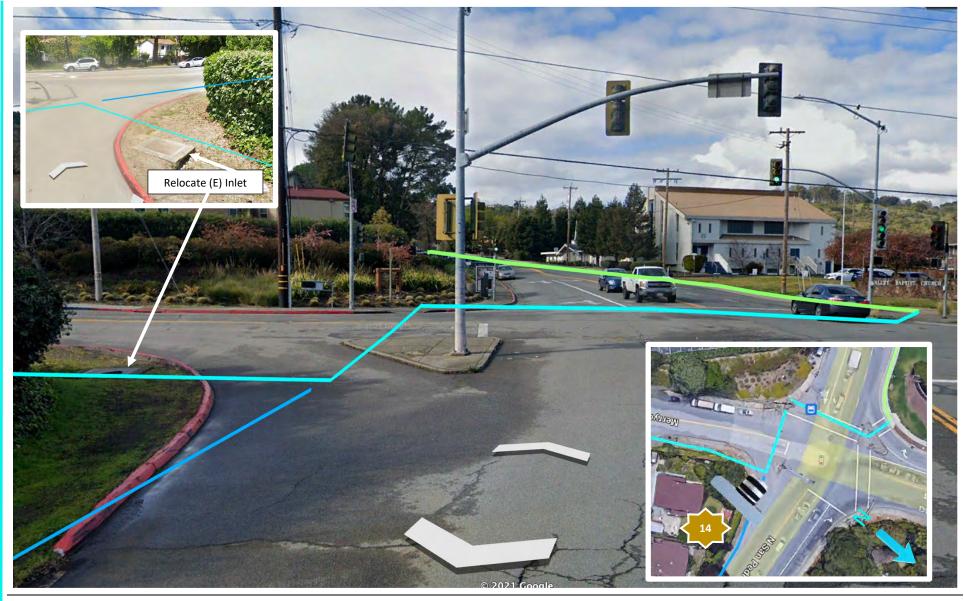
Cyan Segment – Looking West on North San Pedro at Merrydale
